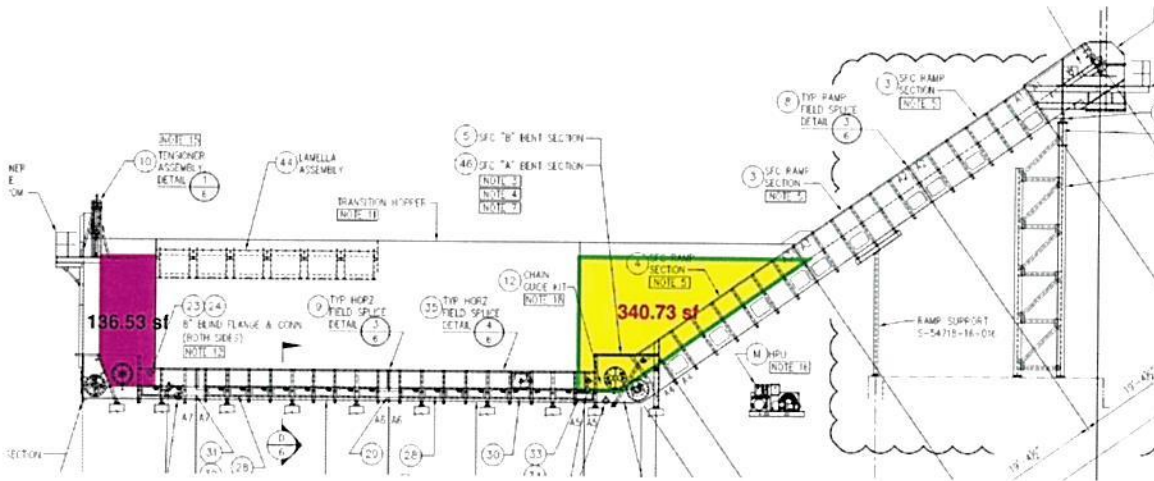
SFC tail and ramp section cross sections (ref. UCC Drawing S-54718-16-012)
